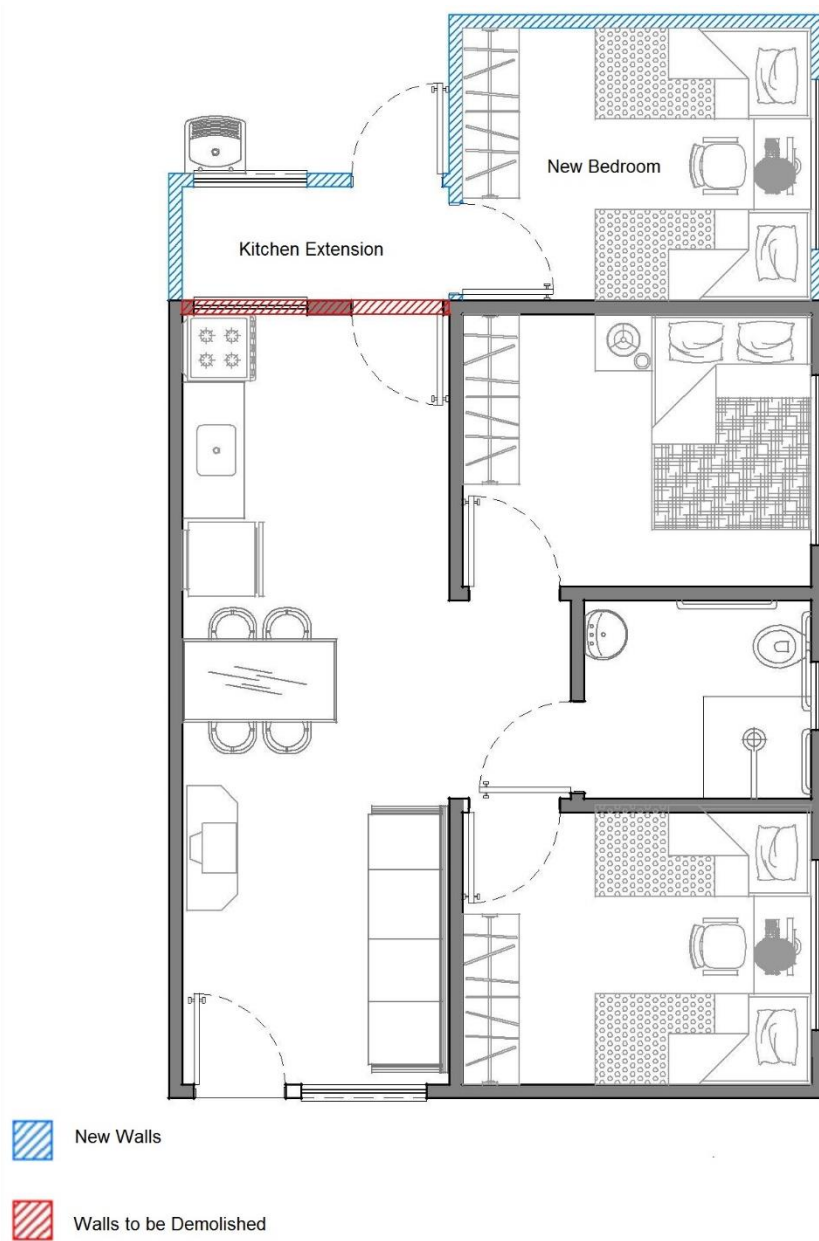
Floor plan of house for people with special needs of Jose Maksoud estate, with one extra bedroom and extended kitchen.
